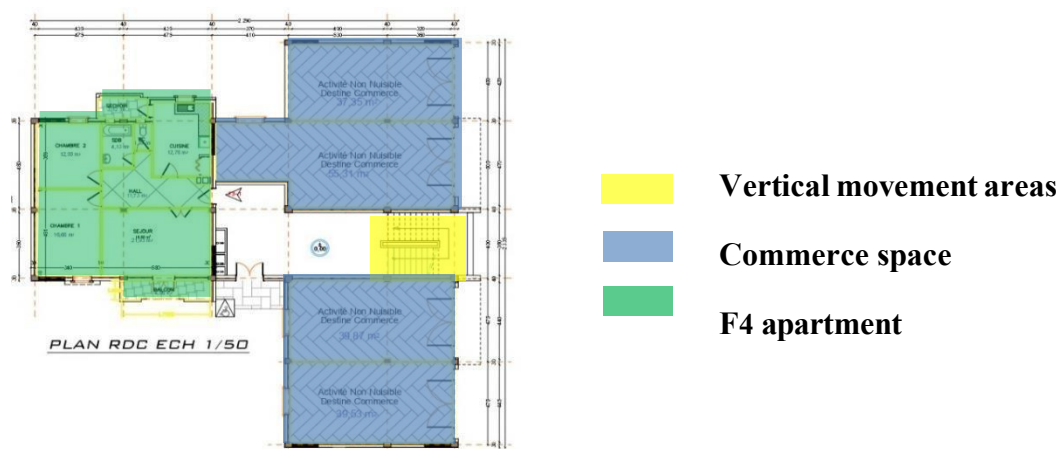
Ground floor plan of Corner Block (Source: design office Nebar Omar +Author treatment , 2025).
